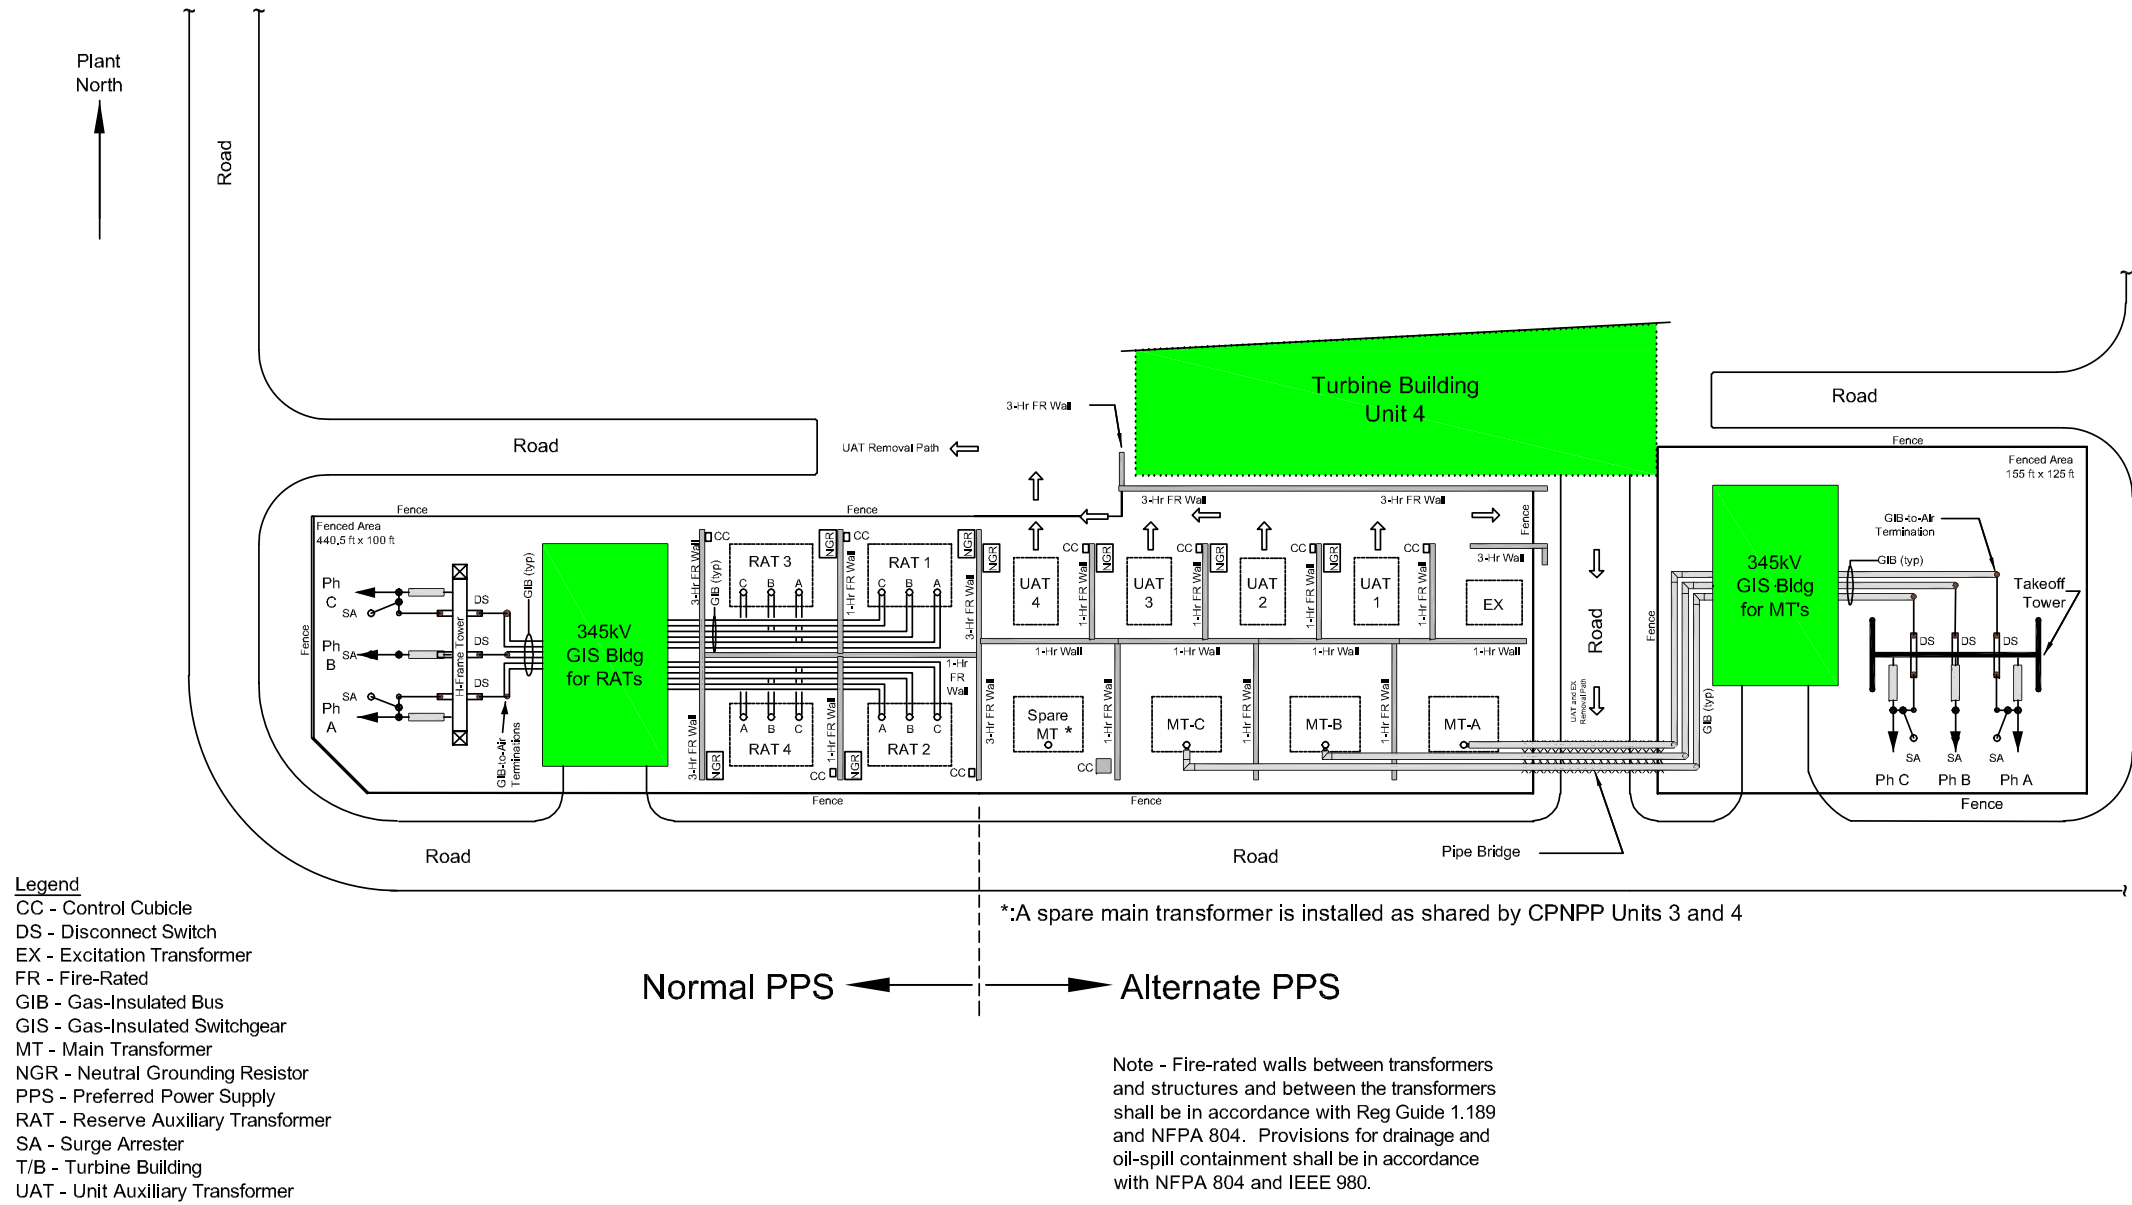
Unit 4 Unit Switchyard Layout
